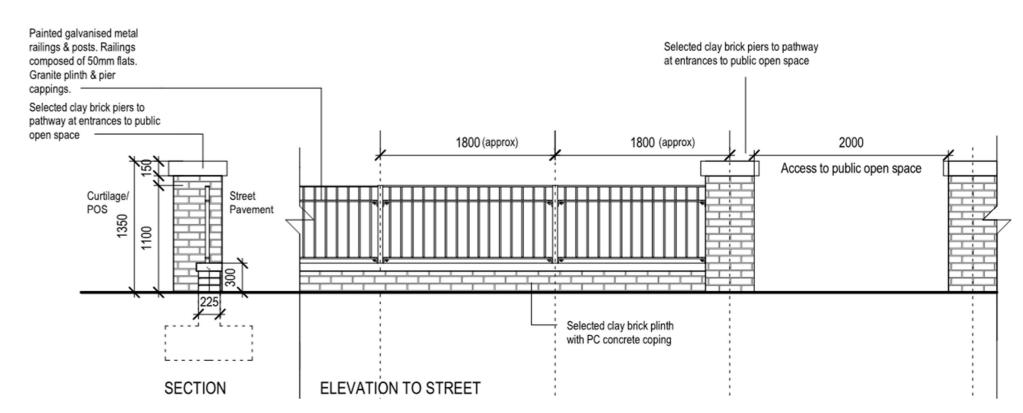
1.1m low painted metal railings on low brick plinth and 1.5m high brick piers to POS and on-street curtilages
